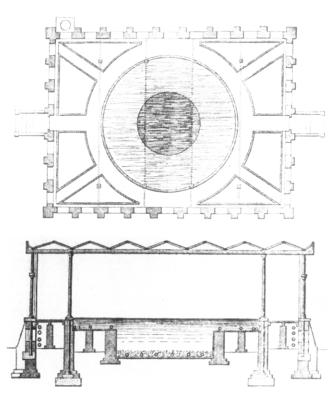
Sir Joseph Paxton's Water-Lily House - 1850 - plan and section
